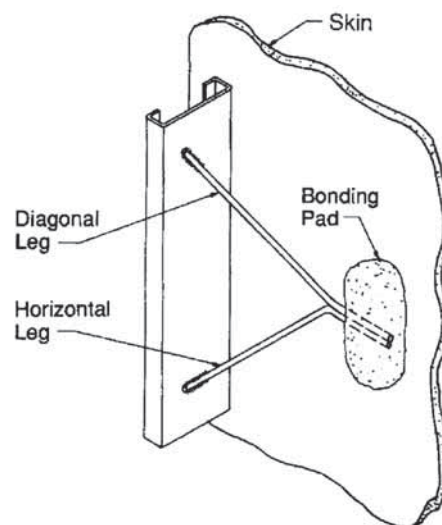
Trussed rod gravity anchor. (Taken from Glass Fiber Reinforced Concrete Panels, Fourth Edition, PCI. Used with permission, Precast/Prestressed Concrete Institute.)
